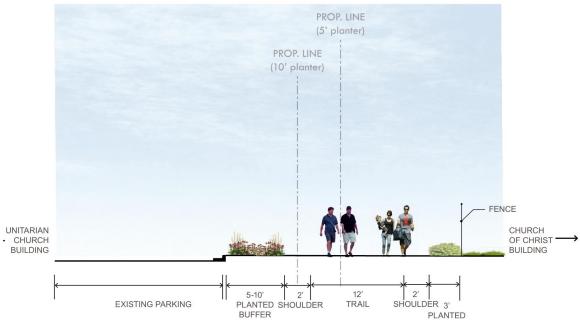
Option 3 – Full Build-Out (North) Typical Section
